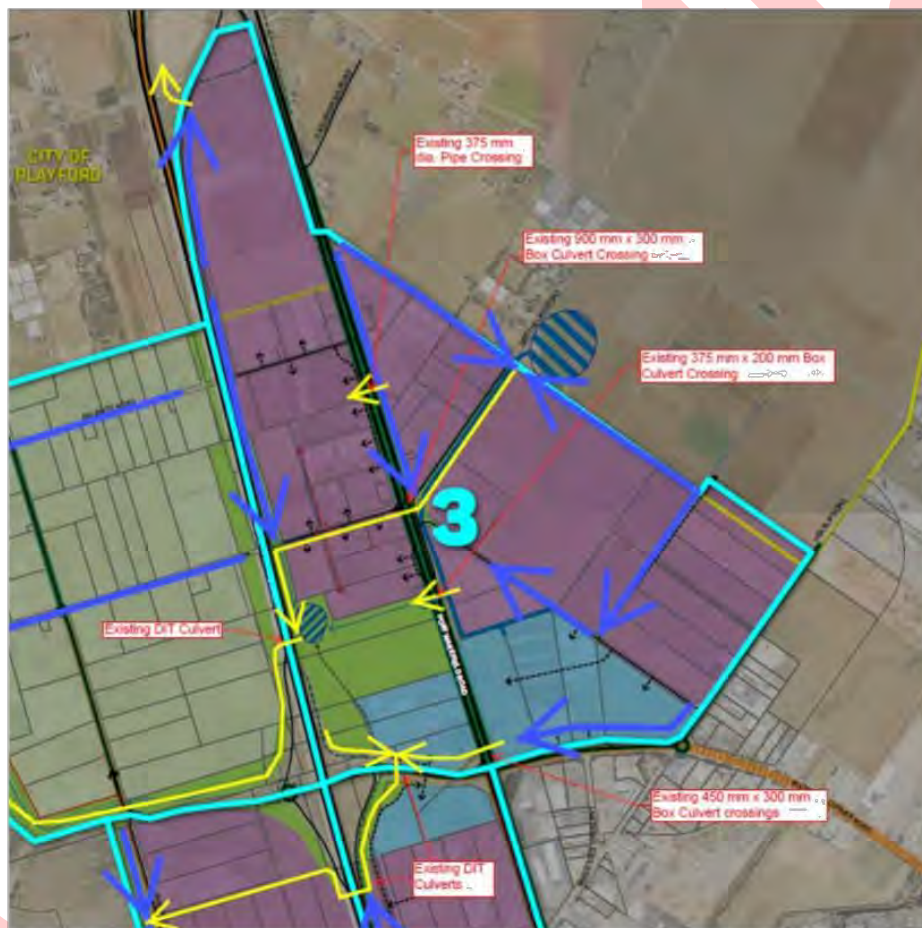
Stormwater Infrastructure Sub-Area 3 Drainage Paths
